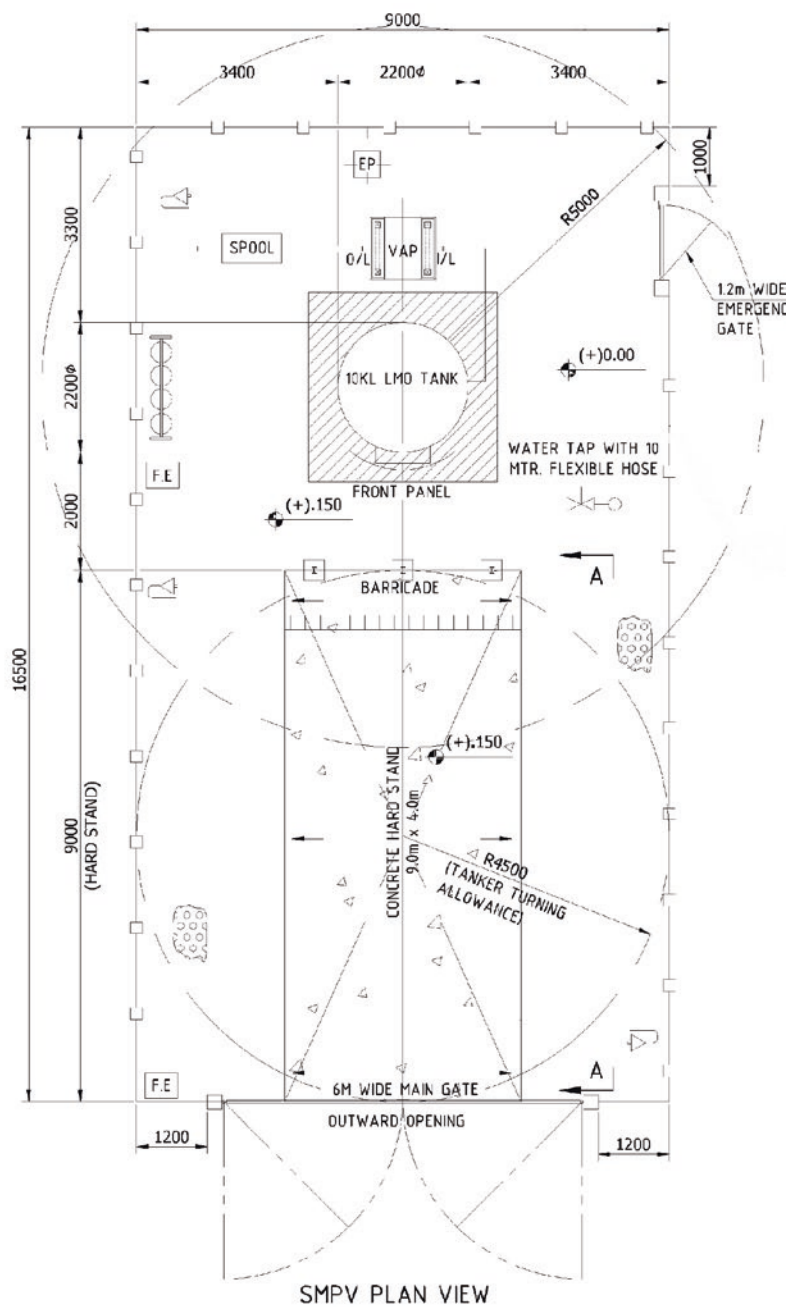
Picture of the site layout of Liquid Oxygen plant
